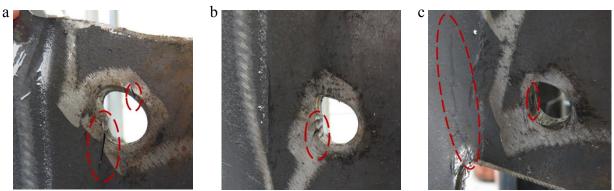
Bearing deformation and fracture along the interior bolt line of specimen BG3-2-13-F-200C at: (a) top bolt hole, (b) middle bolt hole, (c) bottom bolt hole
